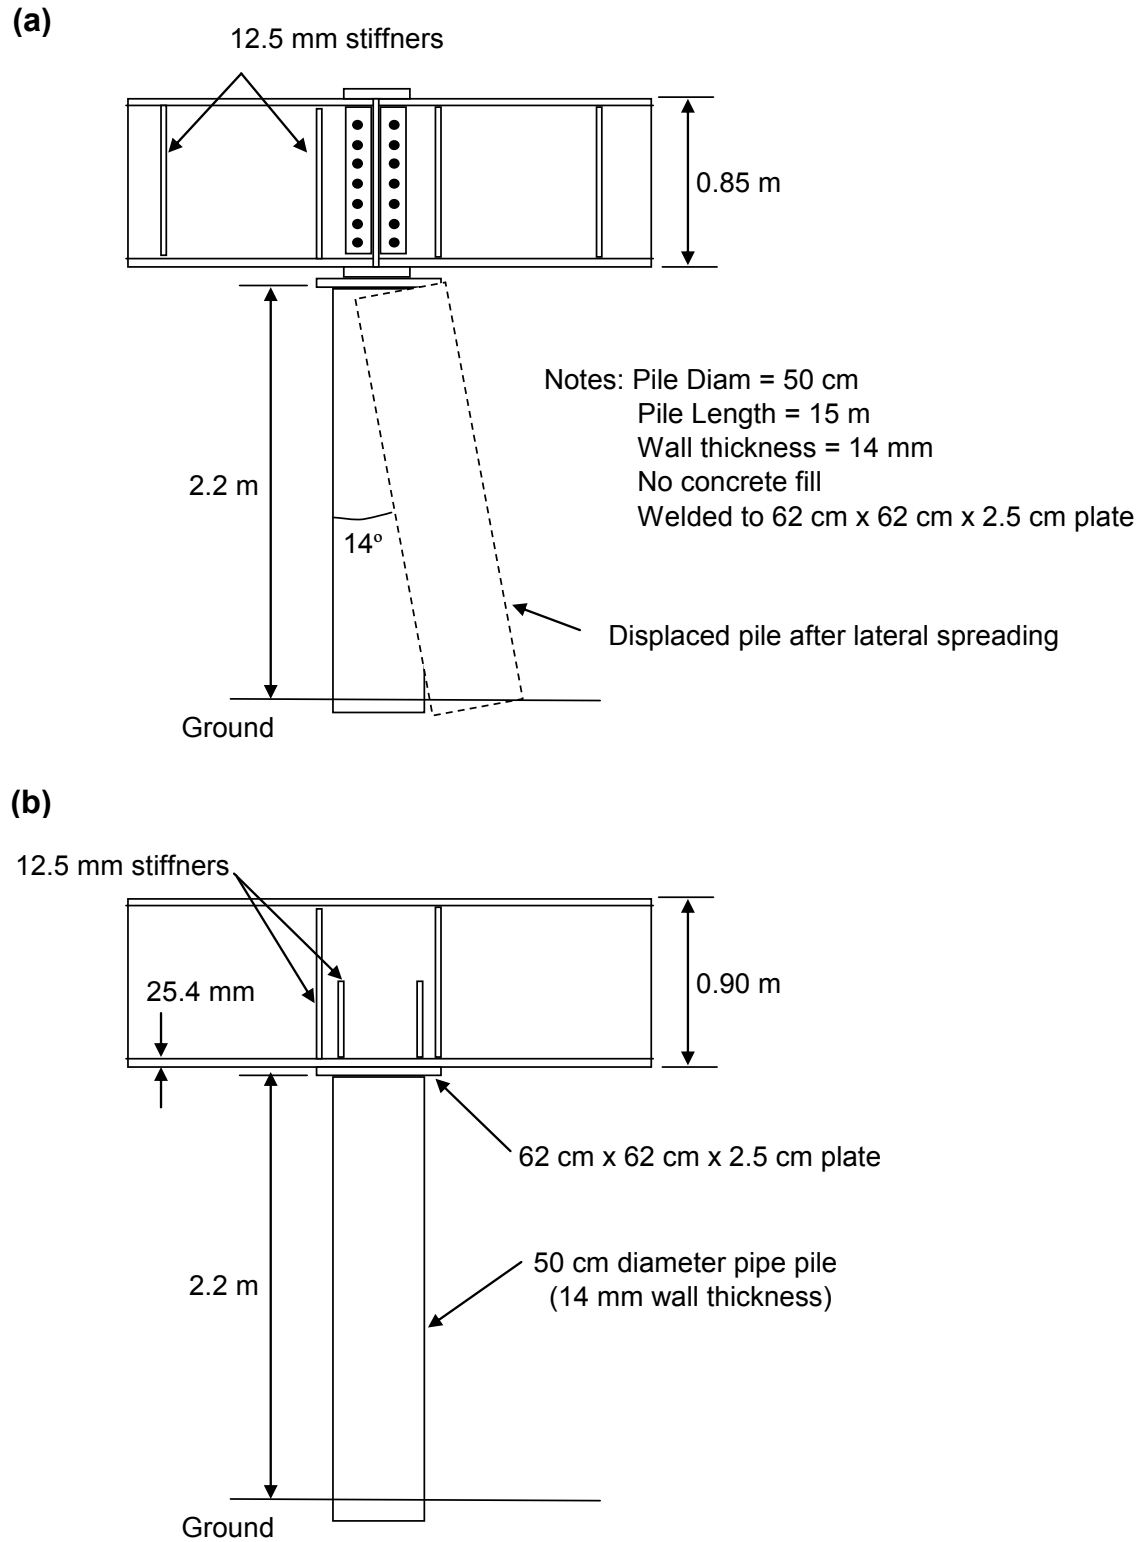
Drawing of pile cap with battered piles before and after lateral spreading (a) longitudinal section and (b) transverse section (S37.0280°, W73.1508°). (Rollins, Mylonakis, and Assimaki)
